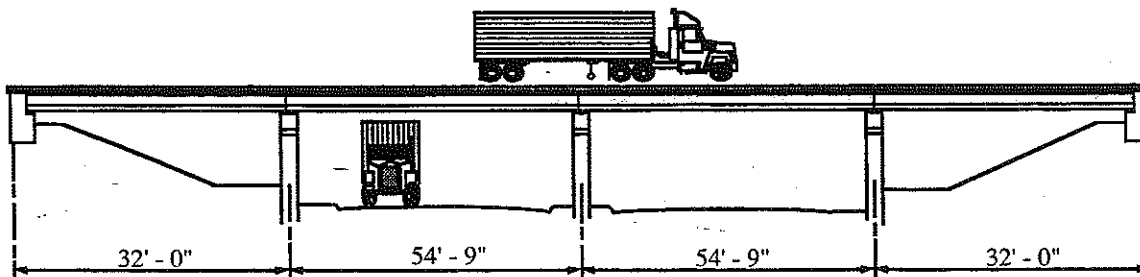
Bridge WY/I94 on Wyoming Road over I-94. Side Elevation.
